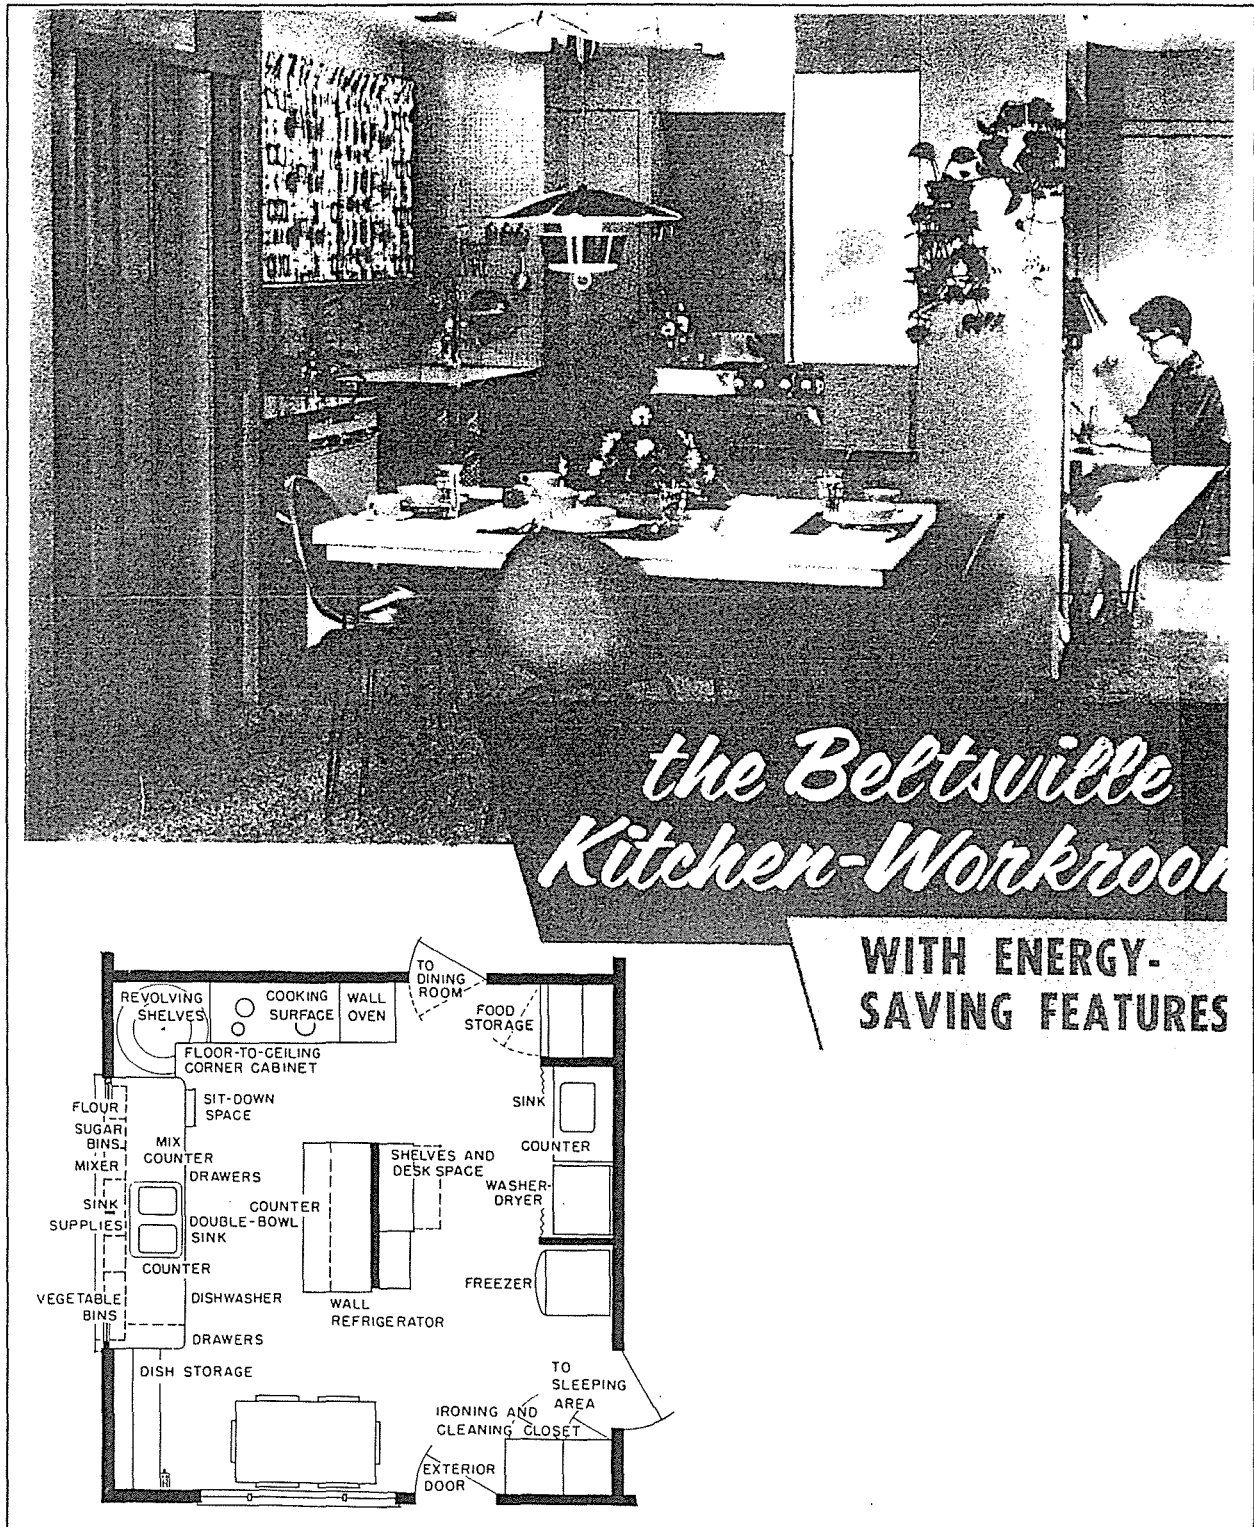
Beltsville Kitchen-Workroom, plan and photograph, 1958
